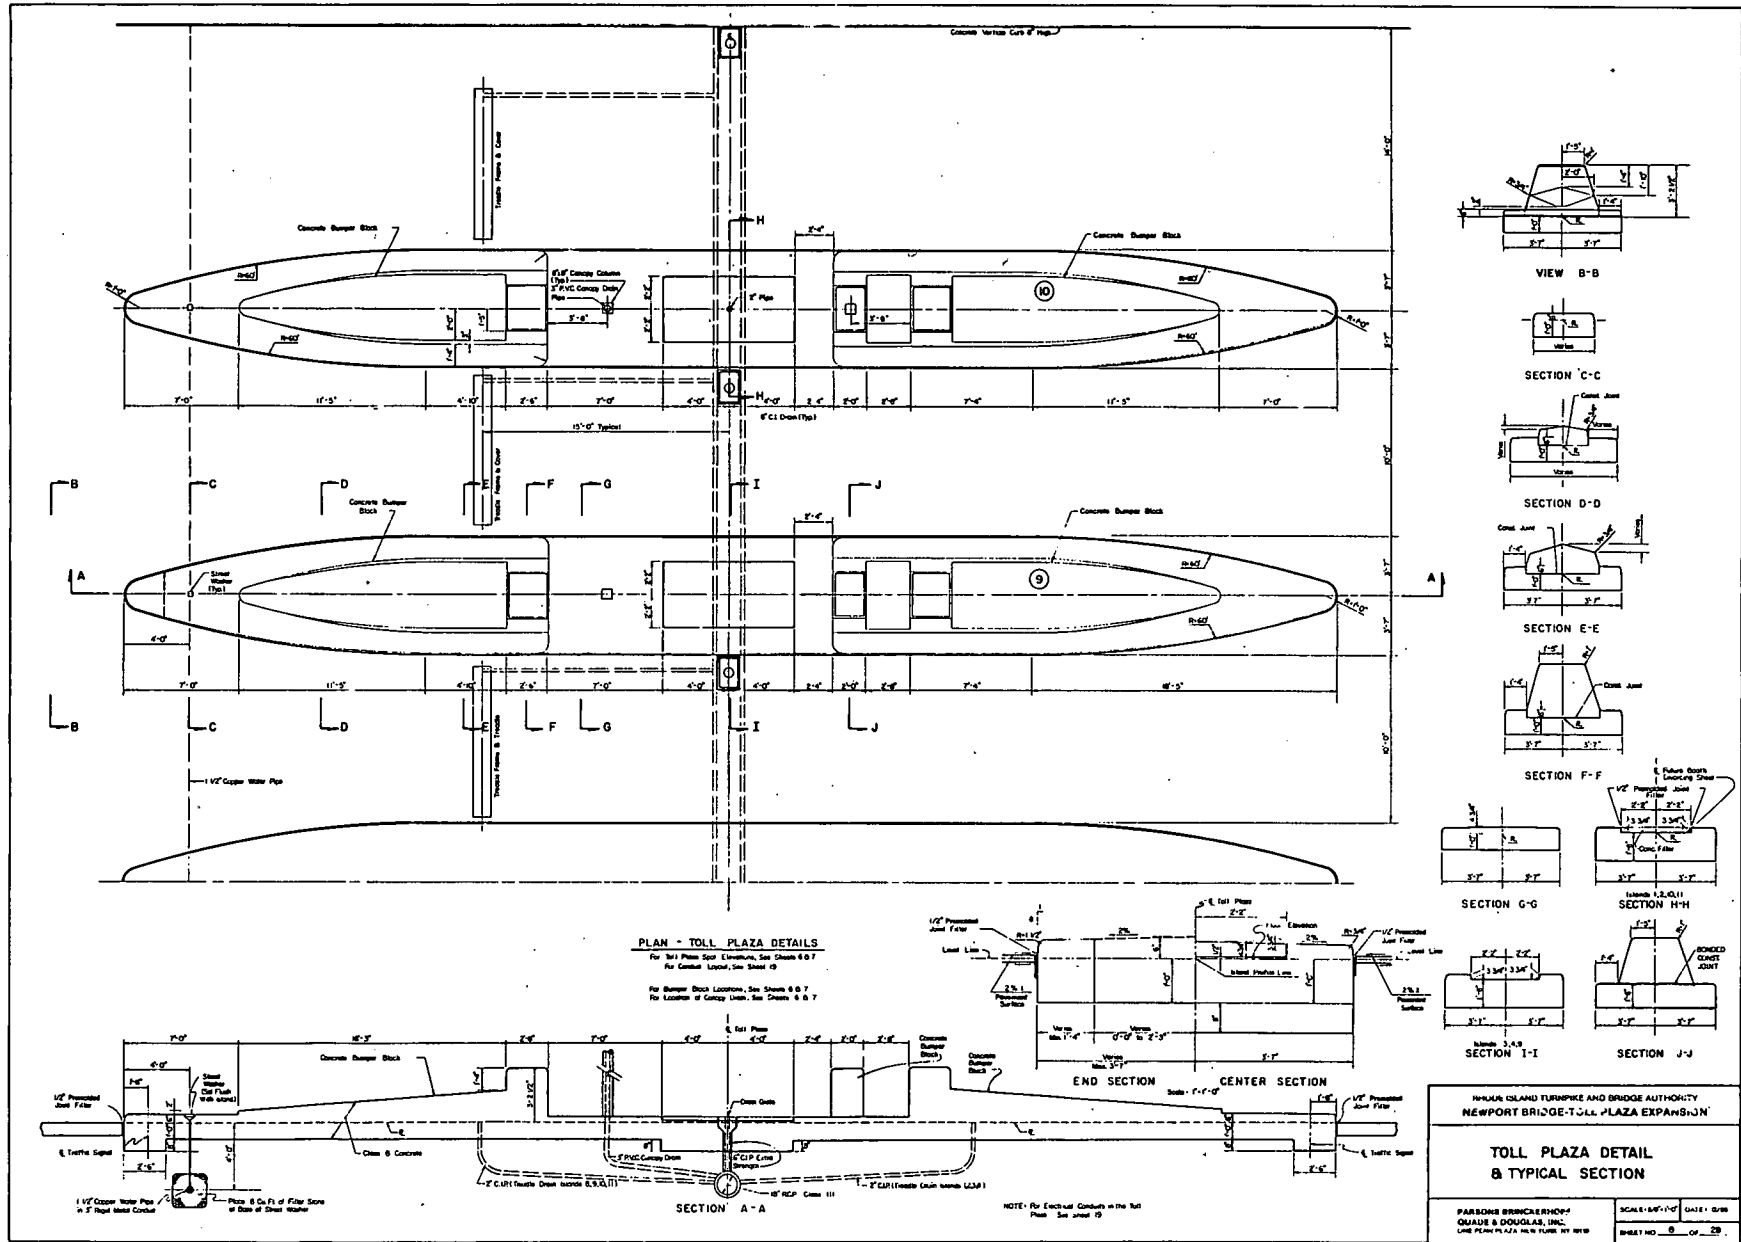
Toll plaza island detail and typical sections, Newport Bridge, Rhode Island.
